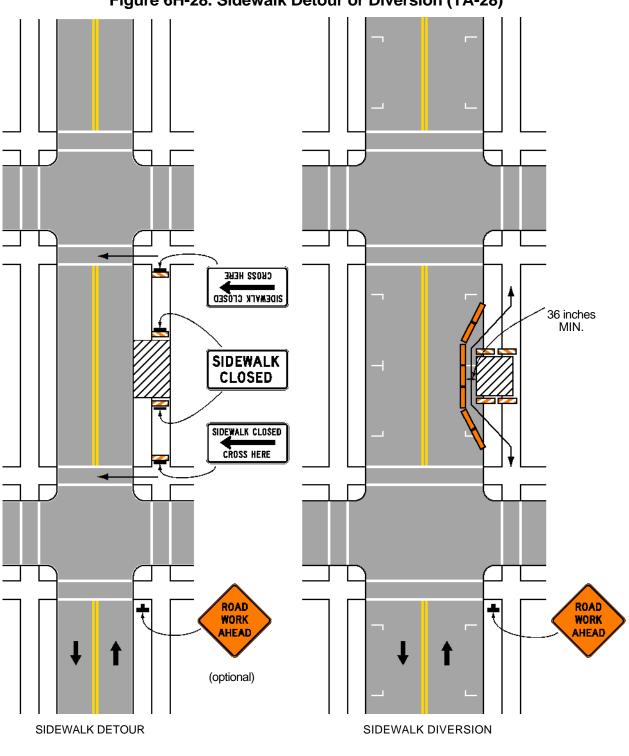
H-28. Sidewalk Detour or Diversion (TA-28)
